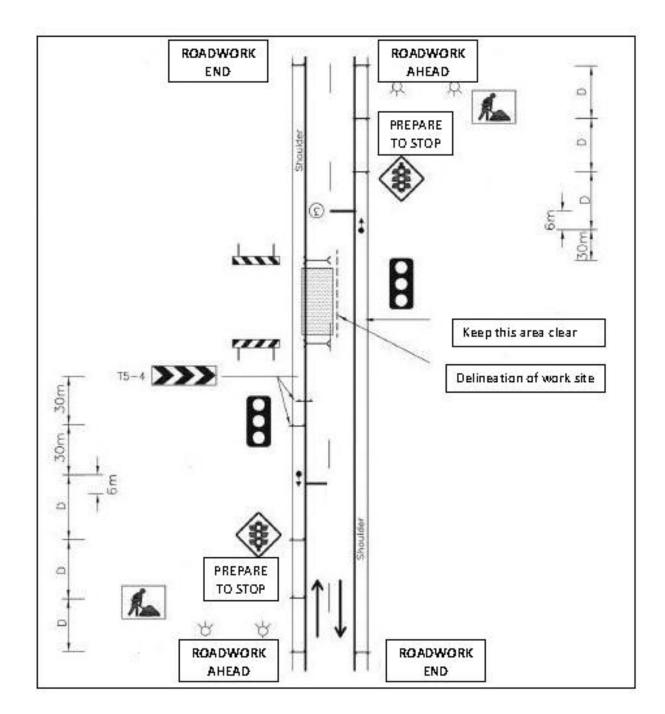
Specimen layout design for traffic signs at a work site occupying half of the carriageway
